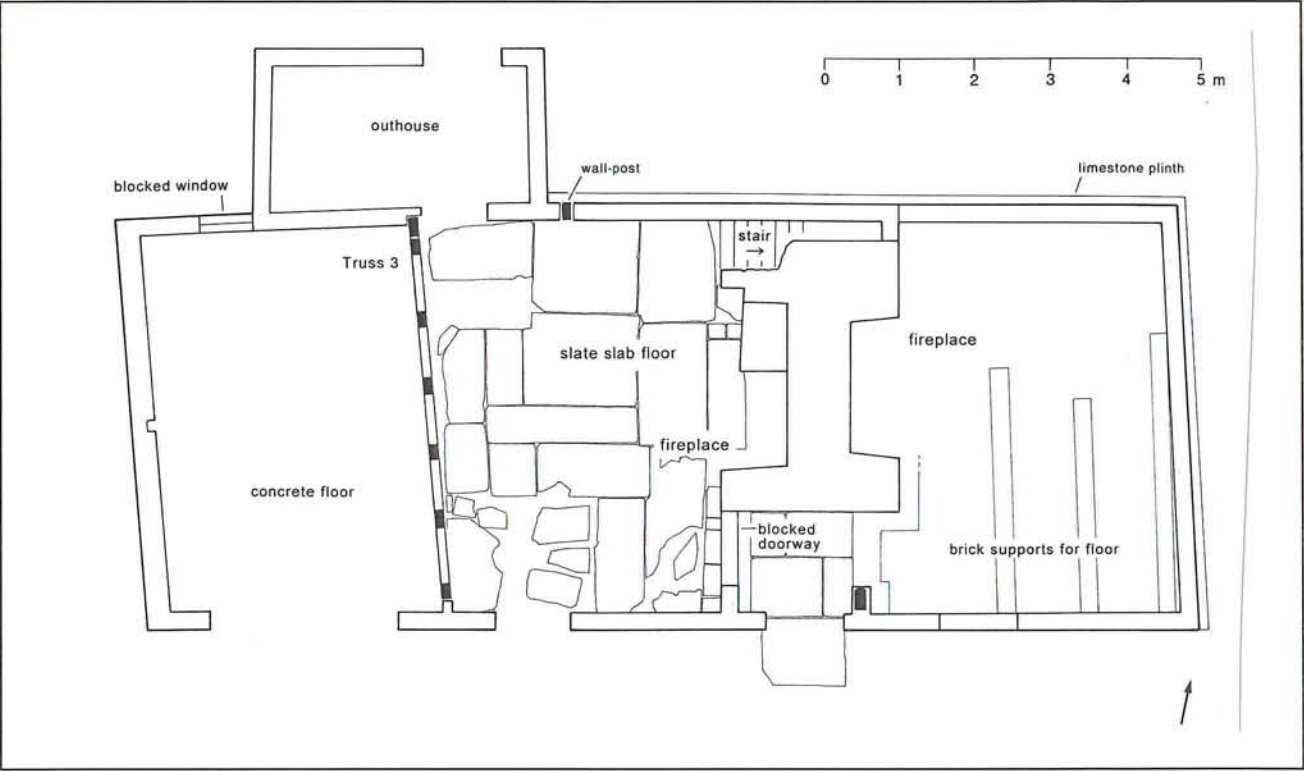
Plan of the Old Farmhouse, 2003. Scale 1:100
